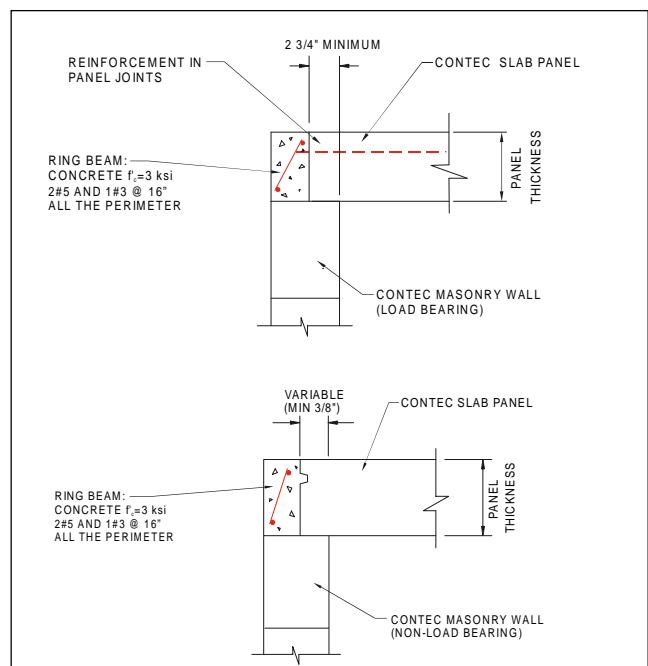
Typical details of panels supported on Contec Masonry Walls.
